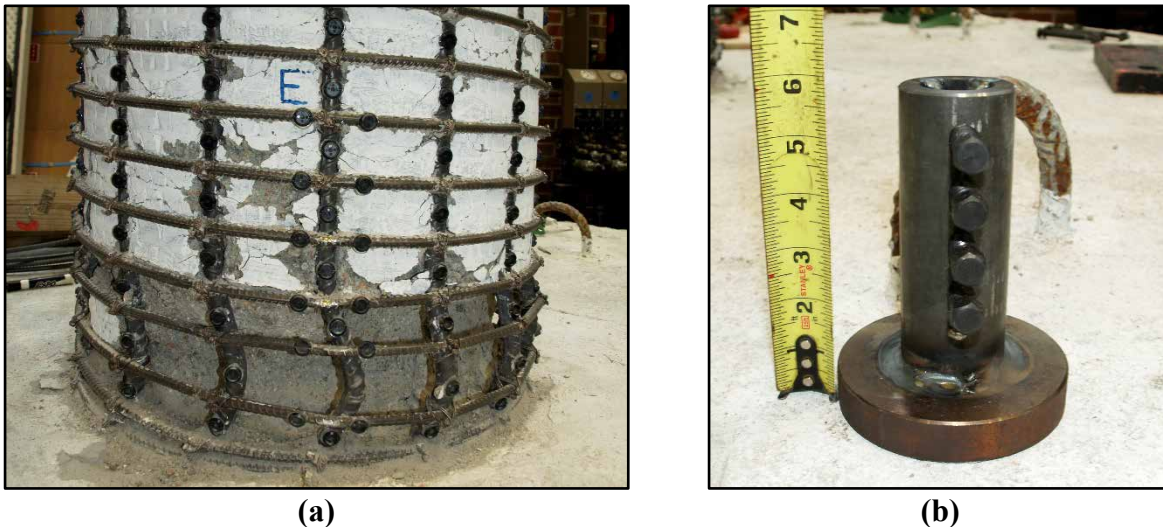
Repair #5 (a) Initial state of damage prior to headed anchor installation; (b) Dayton Superior D252L Bar Lock ® End Anchor.
